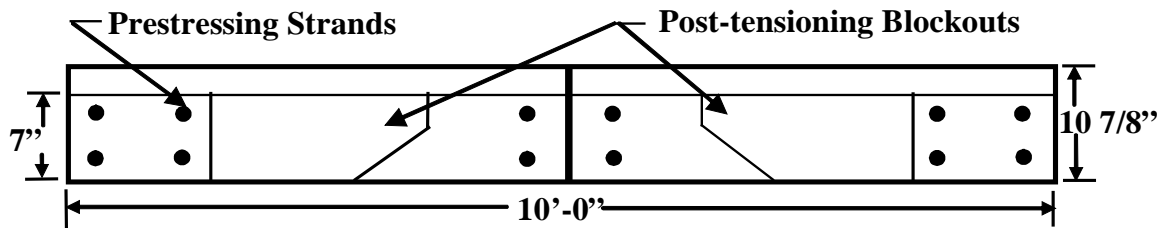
Section of joint panel looking perpendicular to traffic
